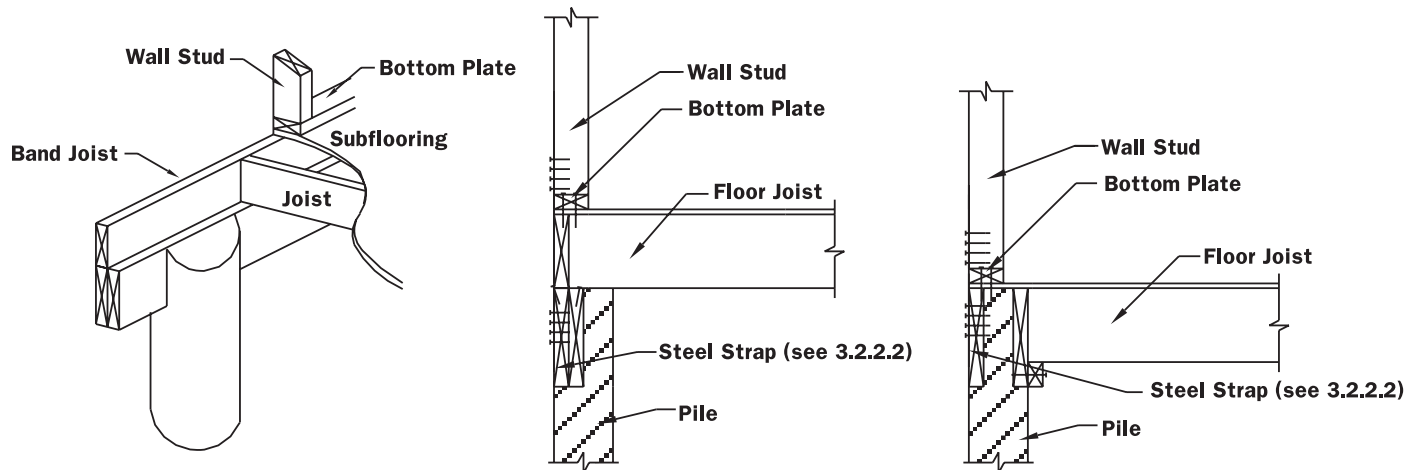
Wall Assembly to Permanent Wood FoundationFigure 3.2e Wall Assembly to Piles
